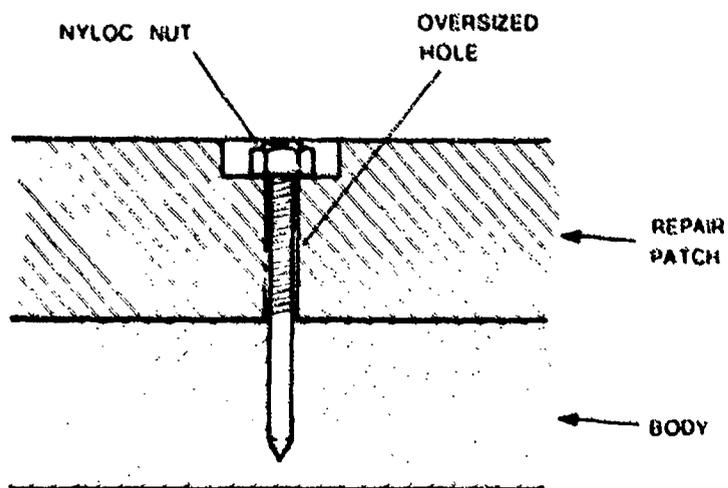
B Schematic diagram of plain/threaded shank fastener repair patch fastening technique.
